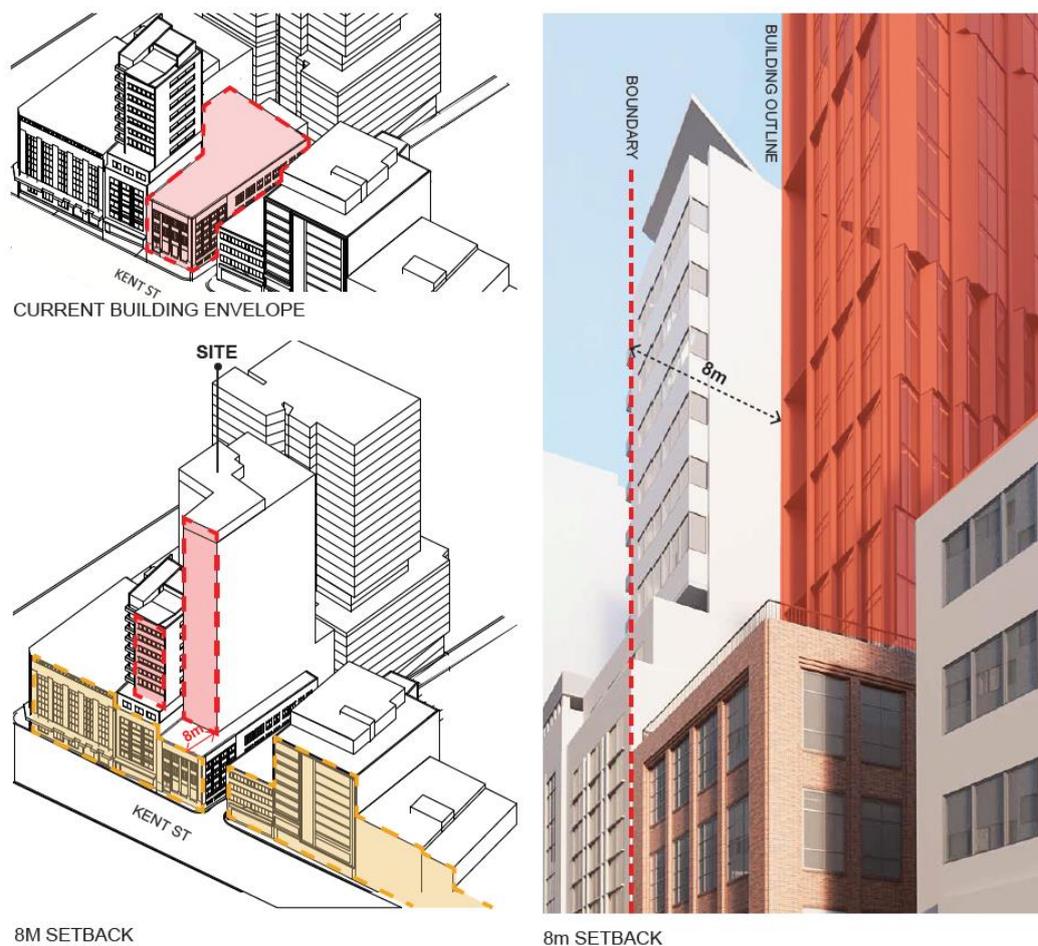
3D views and renders showing the relationship of the proposed tower and front setback with adjoining buildings
